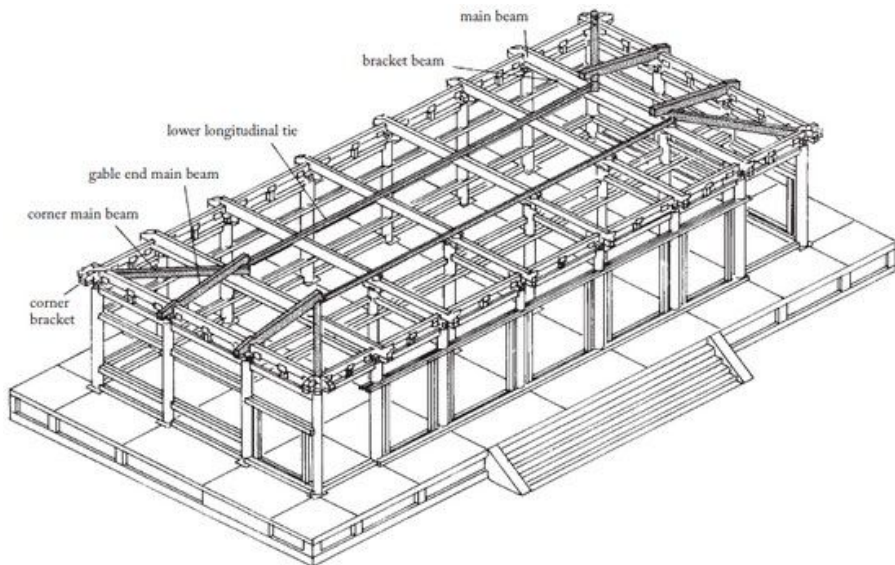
The Picture Hall after installation of the corner main beams, the gable end main beams, and the lower longitudinal ties.
